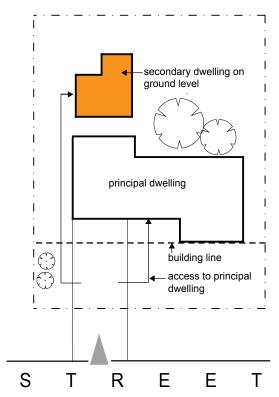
A.2-1: Detached secondary dwelling within the principal dwelling site.
